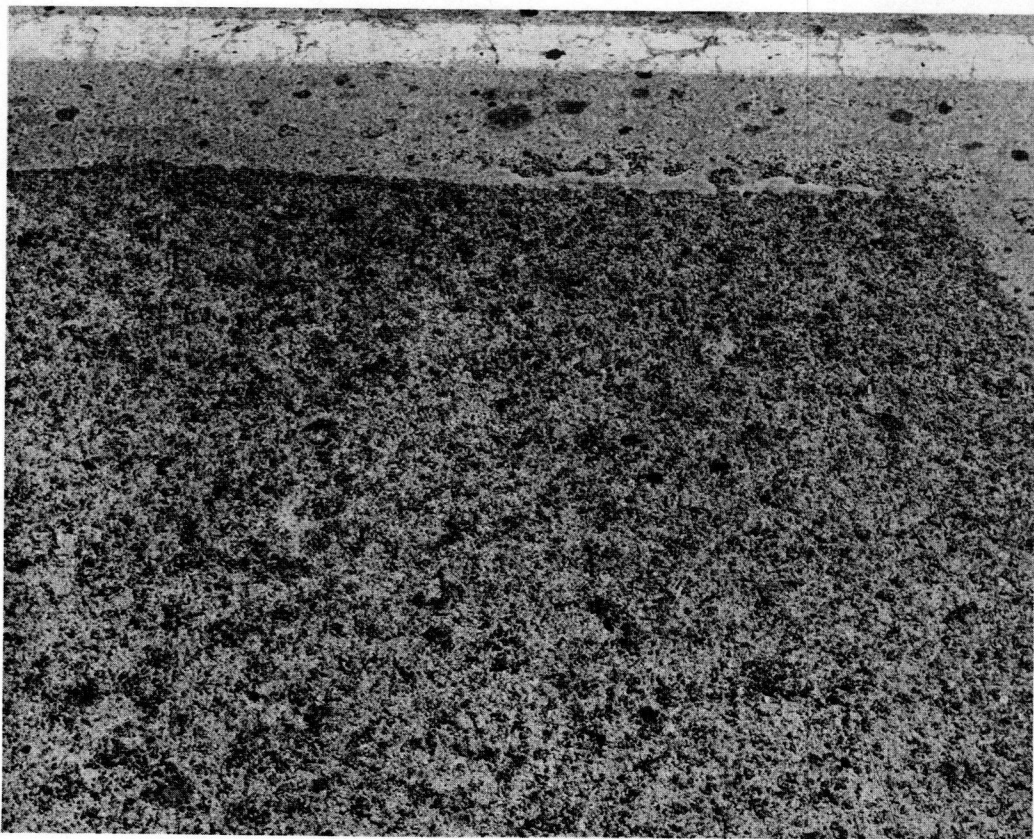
Properly used asphalt slip plane under polyester overlay. No sign of cracks in asphalt concrete after 9 mo. service.
